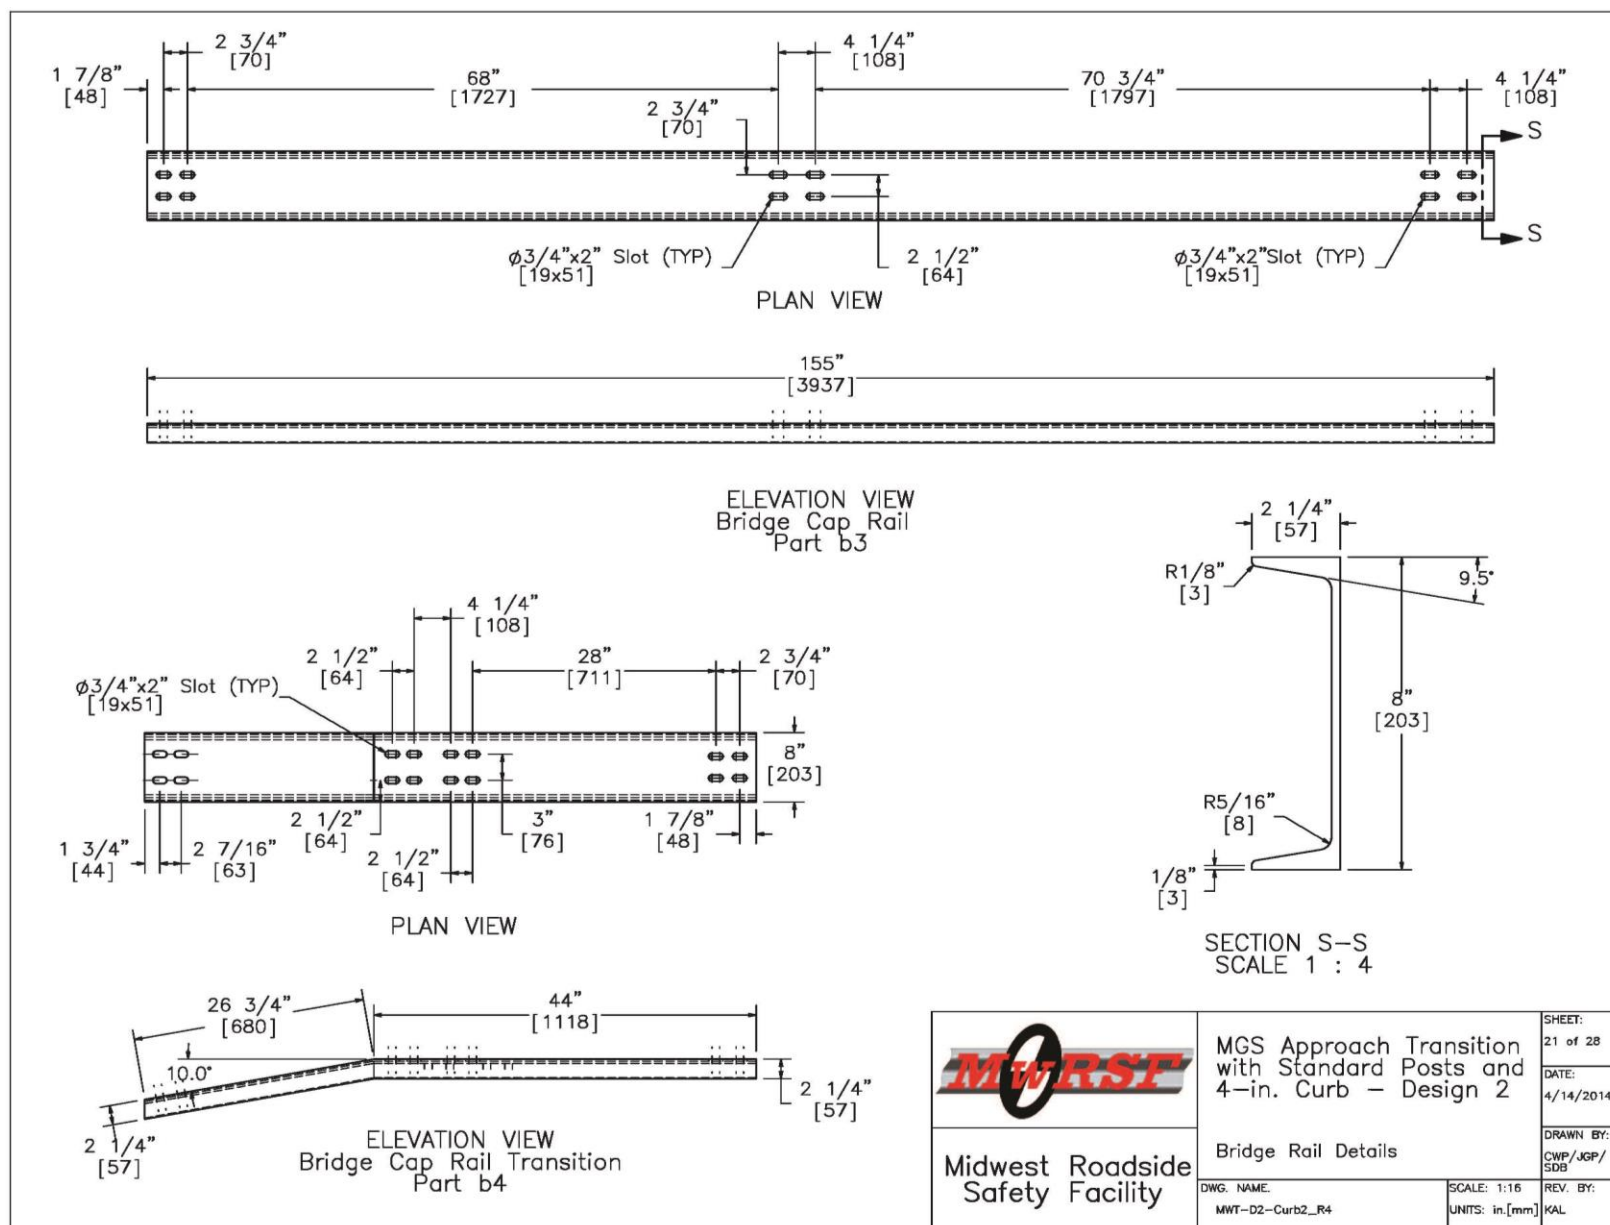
Bridge Rail Details, Test Nos. MWTC-2 and MWTC-3
